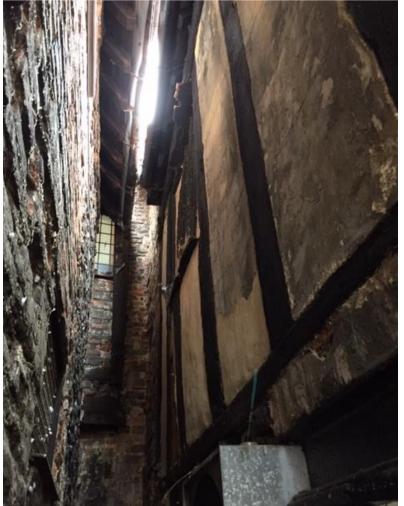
On right of picture – Timber framed east elevation of the Stranger's Club with the unauthorised extract unit (fire risk) located directly below the C16th timber framed jetty beam. On left of picture - West elevation of 26-28 Elm Hill severely damaged by years of moist fatty flammable emissions in the enclosed gap between the buildings.
